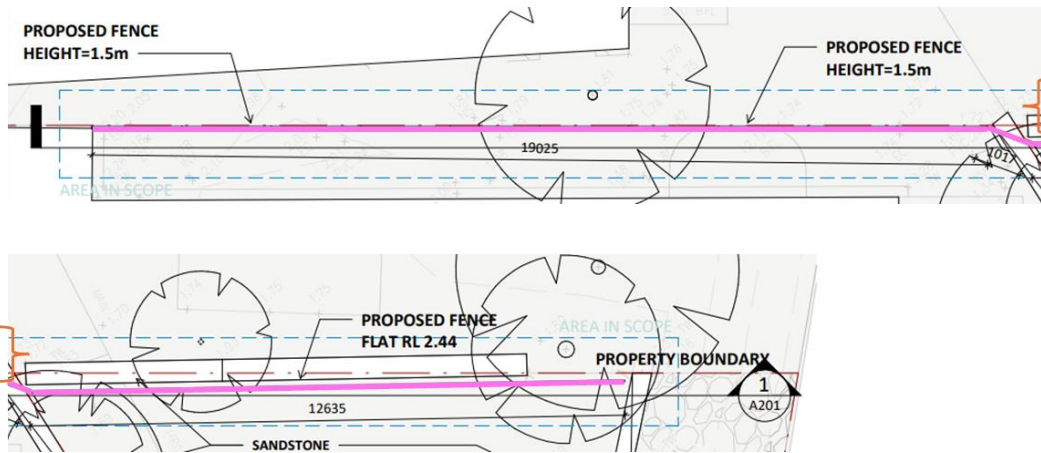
Extract of the plan showing the proposed fence (indicated in pink) in two parts-the taller part (top image) adjacent to the existing building, and shorter part (bottom image) towards the foreshore area
